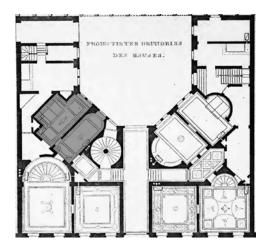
Floor plan of a residential building from Berlin with a designed "Berlin room" (beginning of 19th century) (Source: Rousset, I. (2017). The Berlin Room. The Journal of Architecture, 22(7), pp. 1202–1229)
